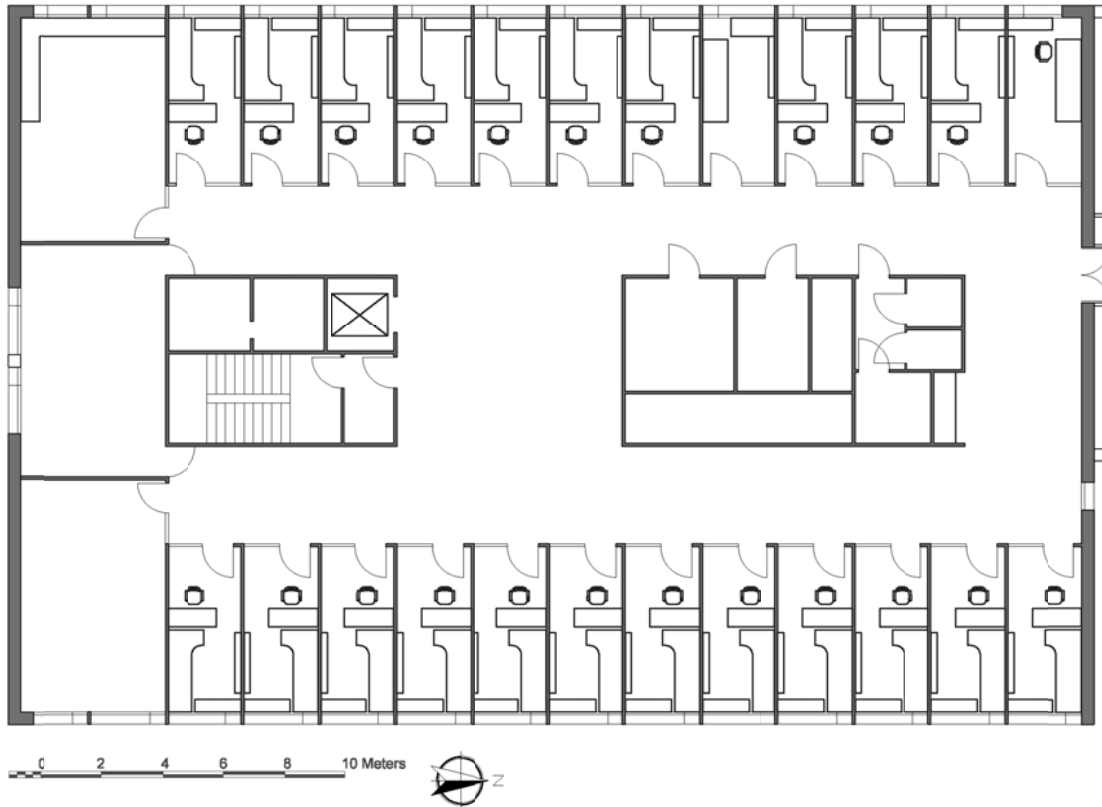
Building B: Typical floor plan, the fourth floor is researched and the connection doors with the old section are usually closed and not much activity takes place through them
